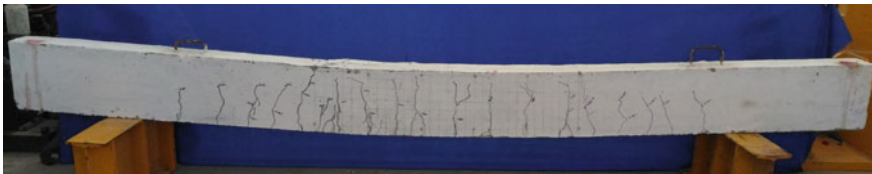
Crack pattern of geopolymer concrete beam
